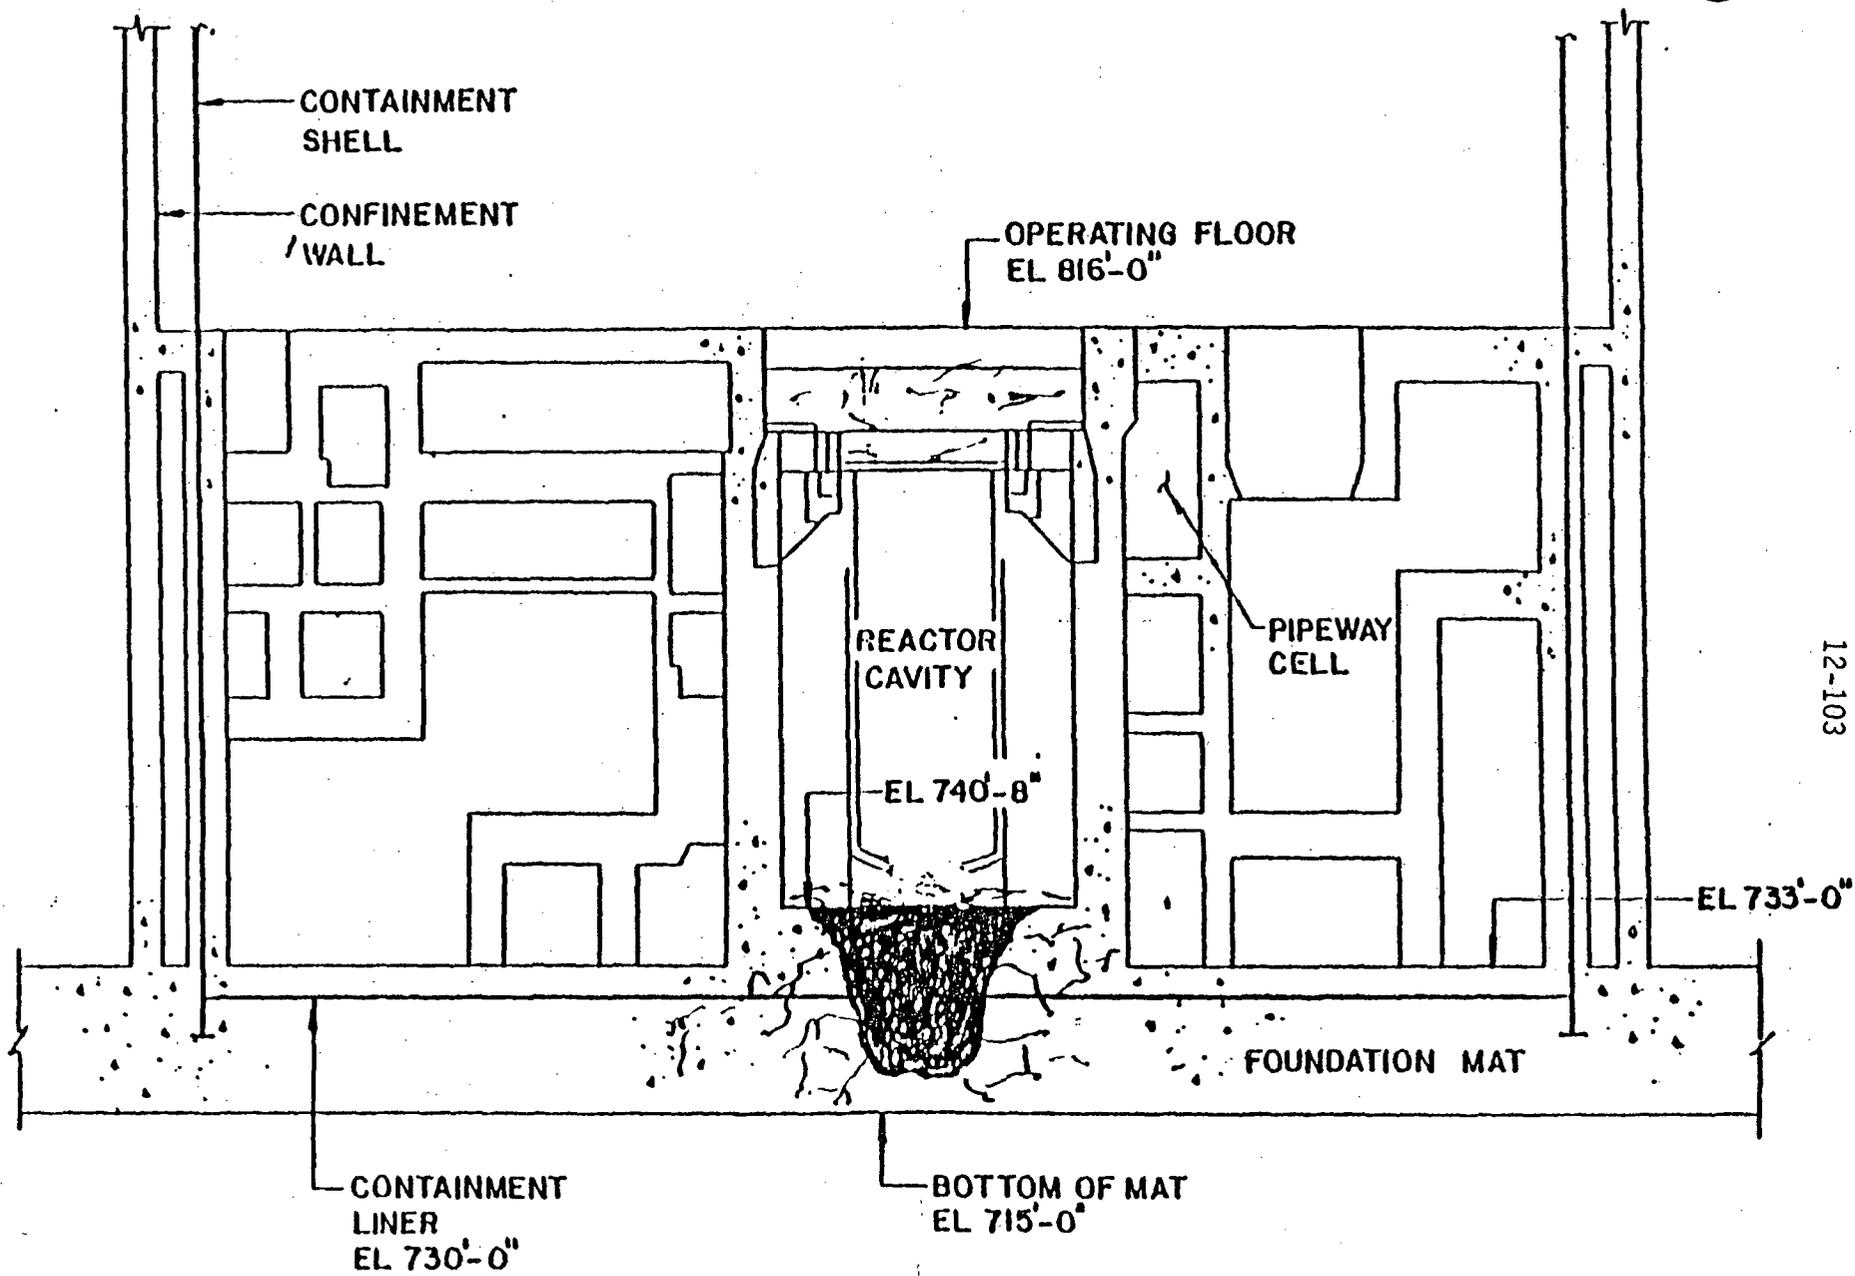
RCB Cross Section Showing Basemat Penetration
